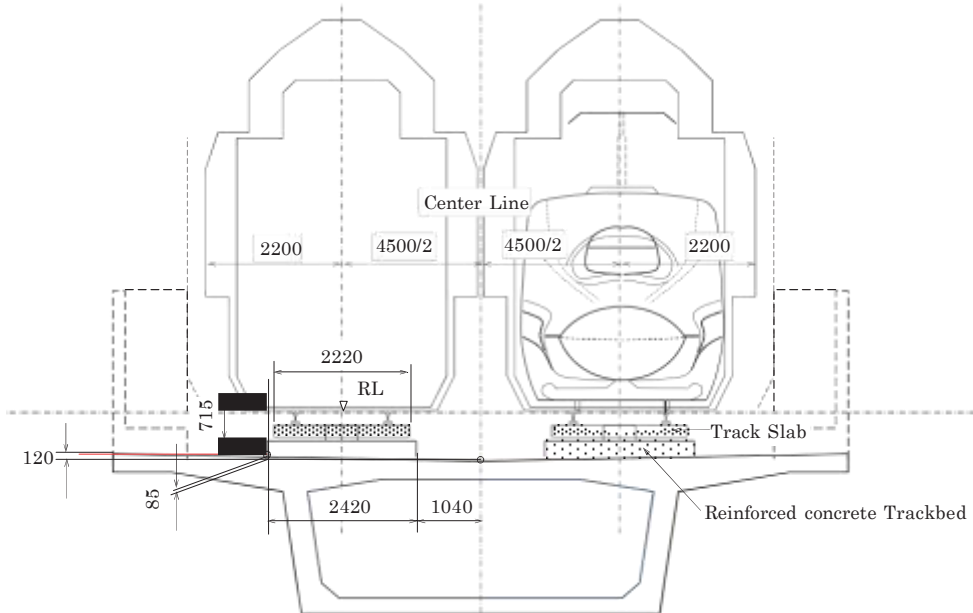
Slab Track Standard Cross-section (Viaduct and Bridge sections)
